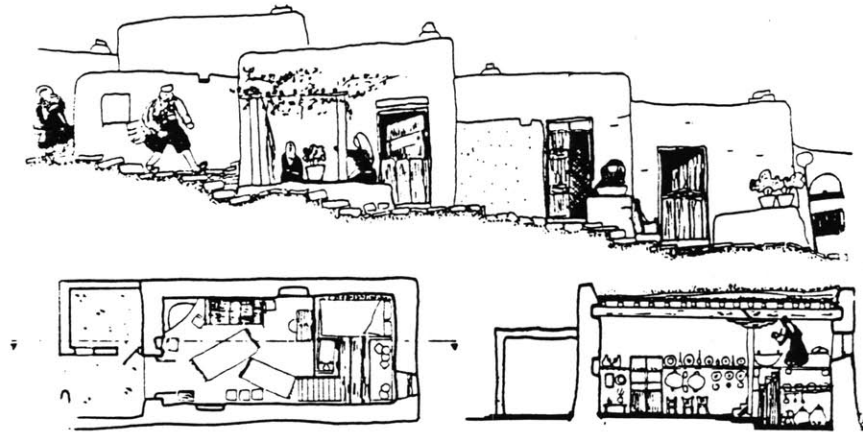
Megaron Houses, plans, sections, and front elevation
